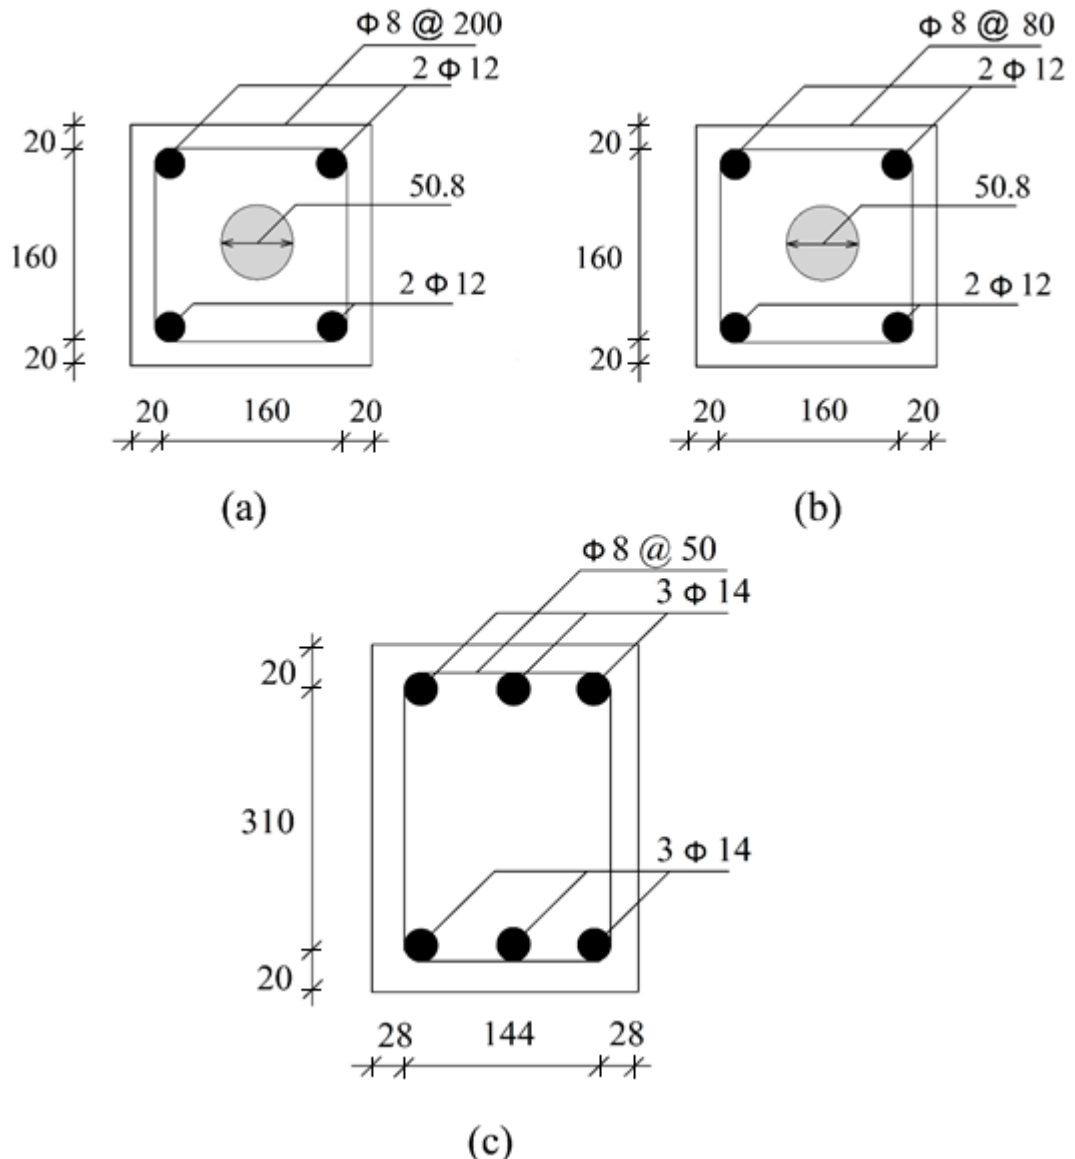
Cross section of: (a) unconfined specimens; (b) confined specimens; (c) footing
